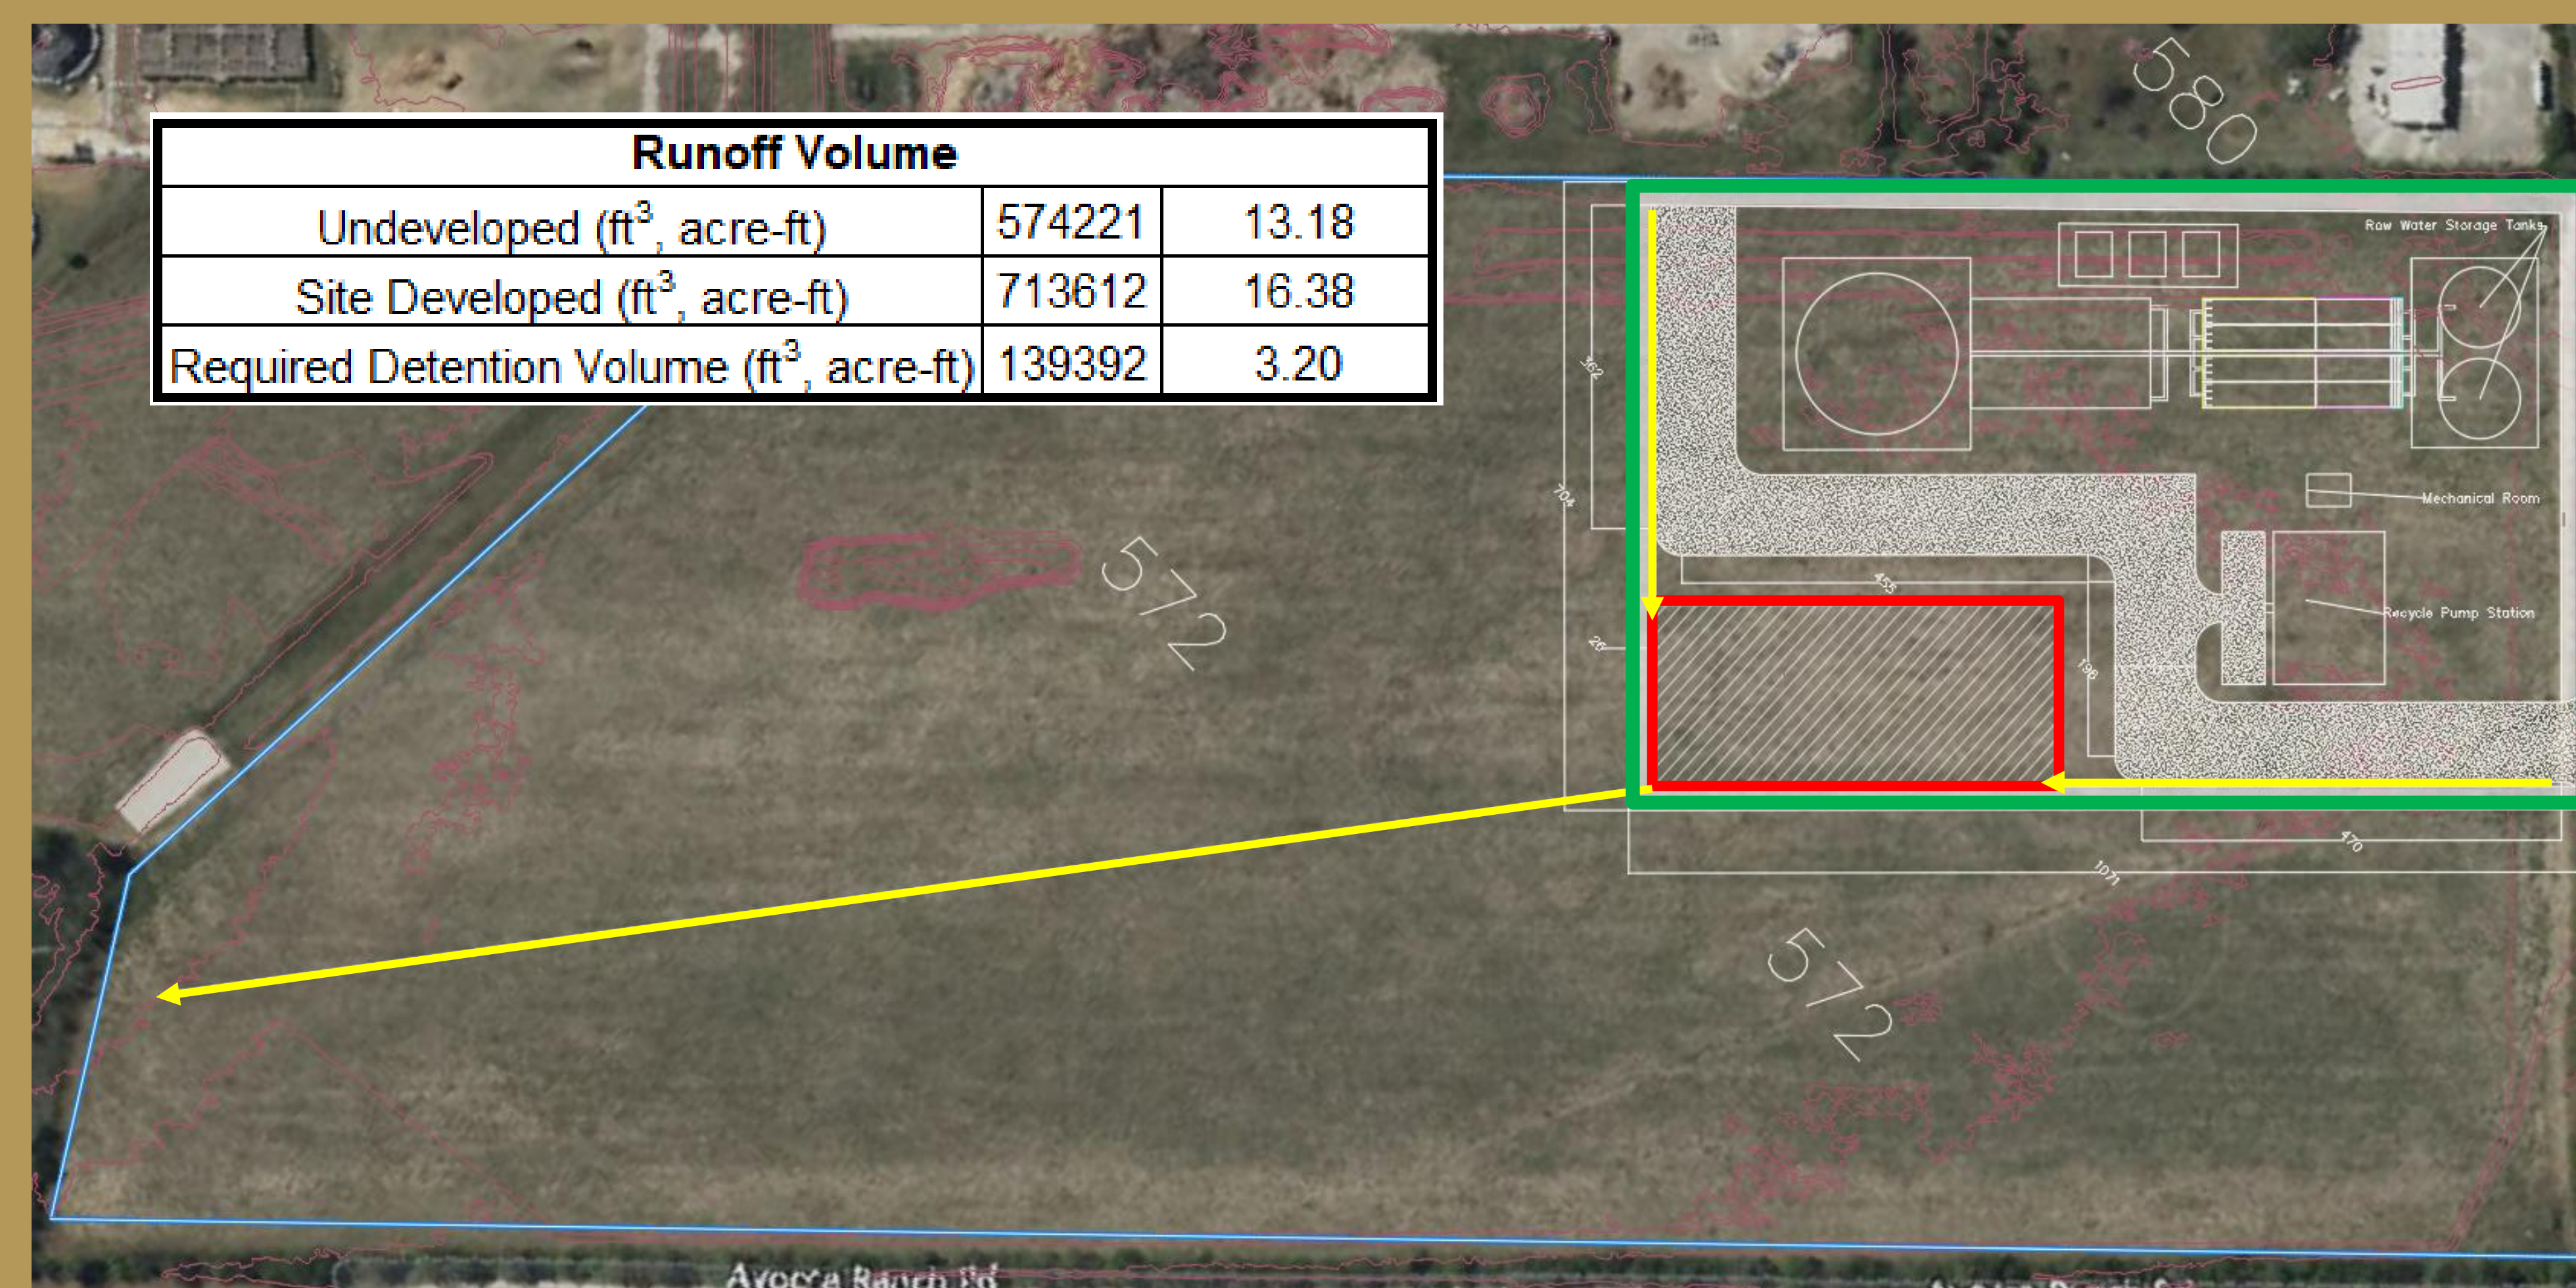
Developed site layout including treatment, berm, and stormwater detention pond, and elevation contours (ESRI).
